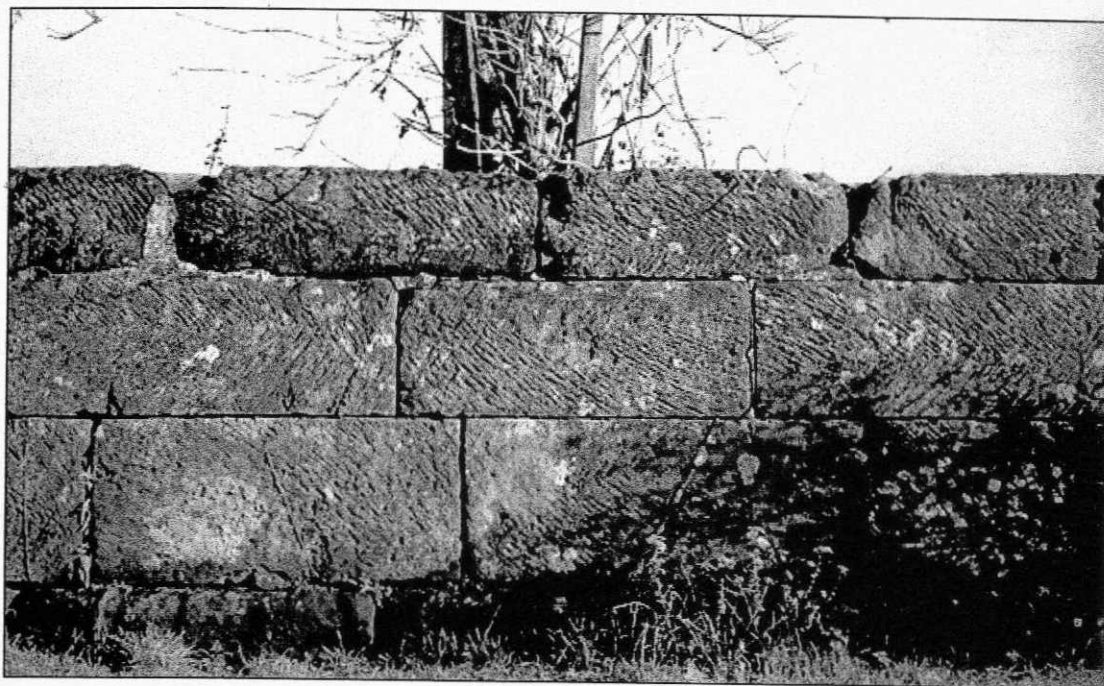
(above): Section of tooled red sandstone wall on eastern side of farmyard
